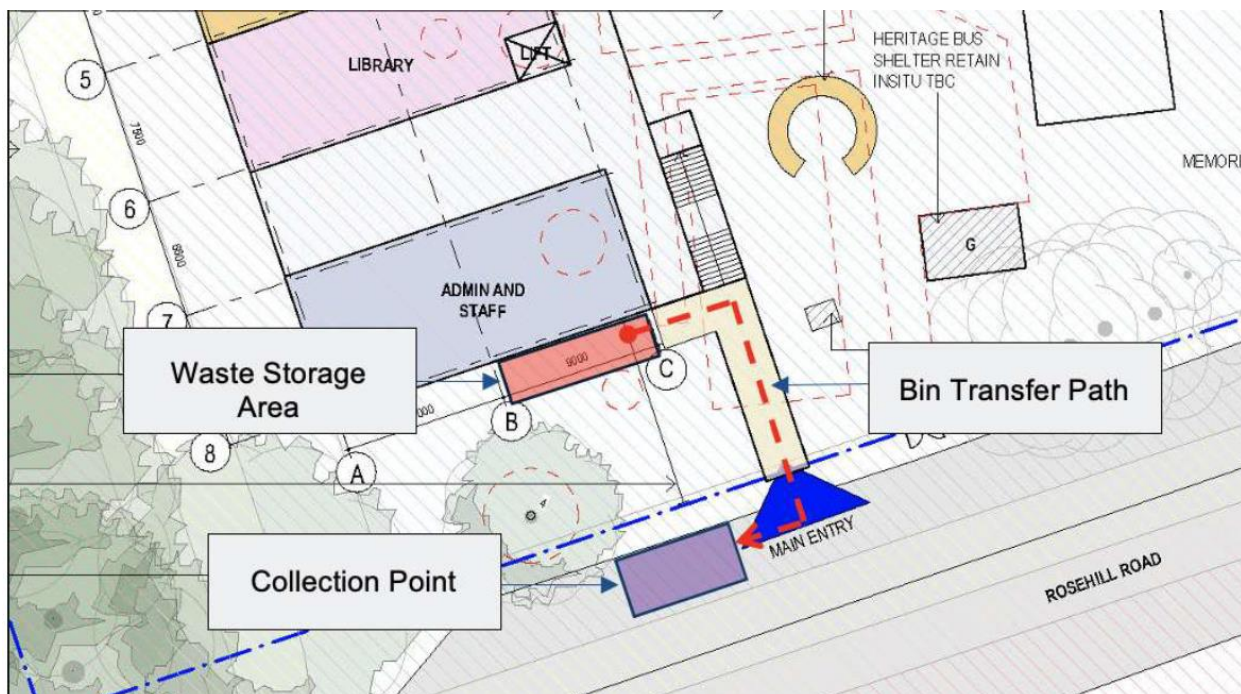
Waste storage area, bin transfer path and collection point (Source: MRA Consulting Group).
